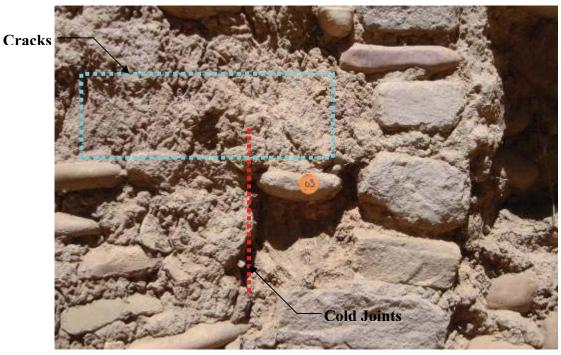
Cracks; cold joints on wall surface: House Two (TAP 2006)
